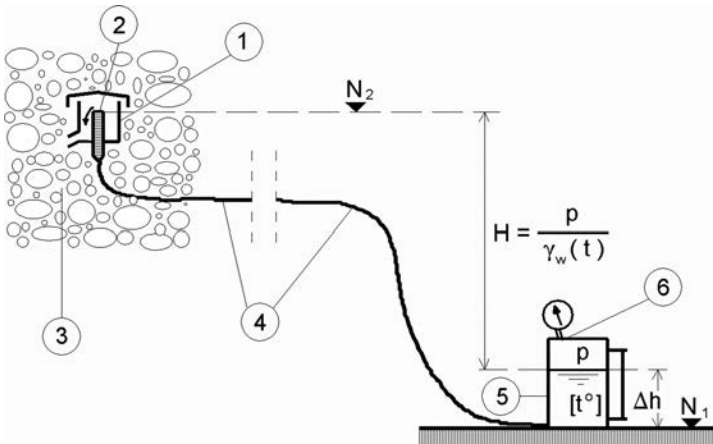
Hydraulic elevation benchmark with measuring device. (1) Closed concrete box with a drain; (2) overflow tube; (3) compacted embankment; (4) jointing pipe; (5) tank with water under pressure, calibrated glass for measuring the level, and a manometer; (6) outlet connection for a pump with compressing of the air.
